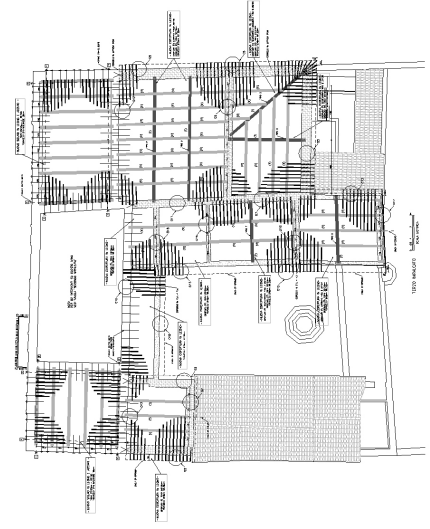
Typical floor plan illustrating the floor framing reconstruction.
